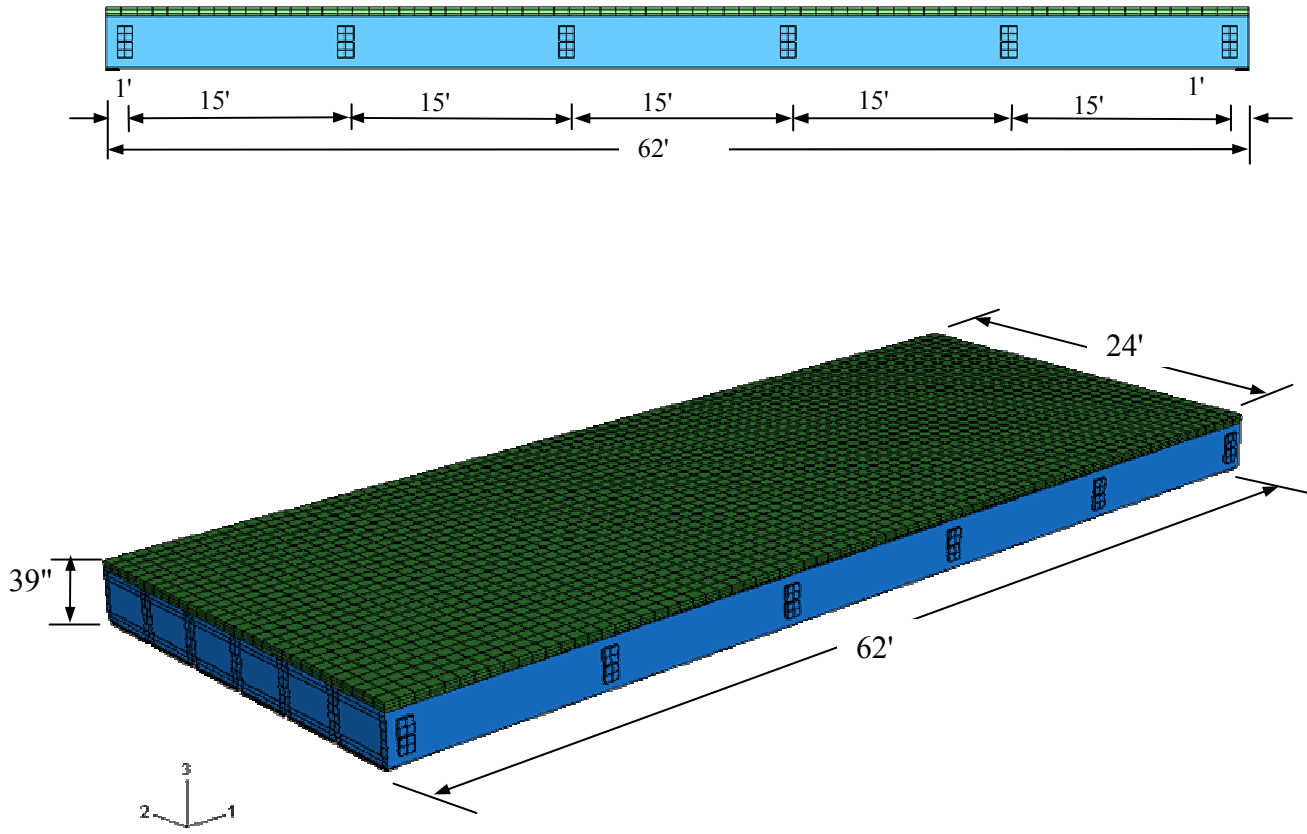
Assembly for modified 62 ft span bridge model.
